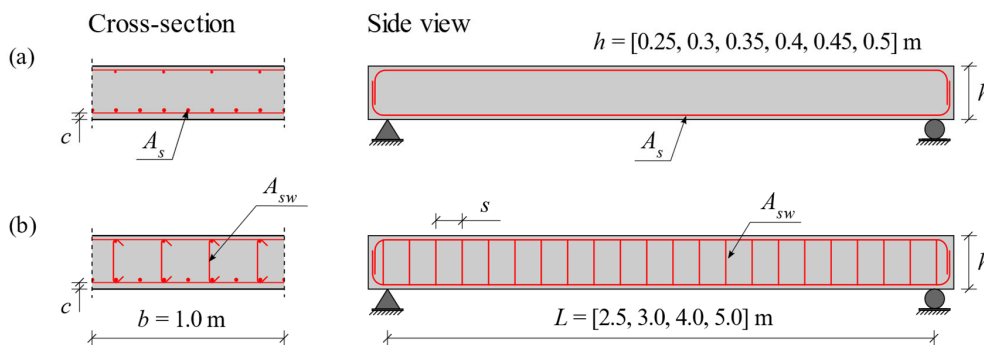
Geometry conditions of case study: a) geometry and reinforcement layout of the slabs without stirrups, b) geometry and reinforcement layout of the slabs with stirrups.
